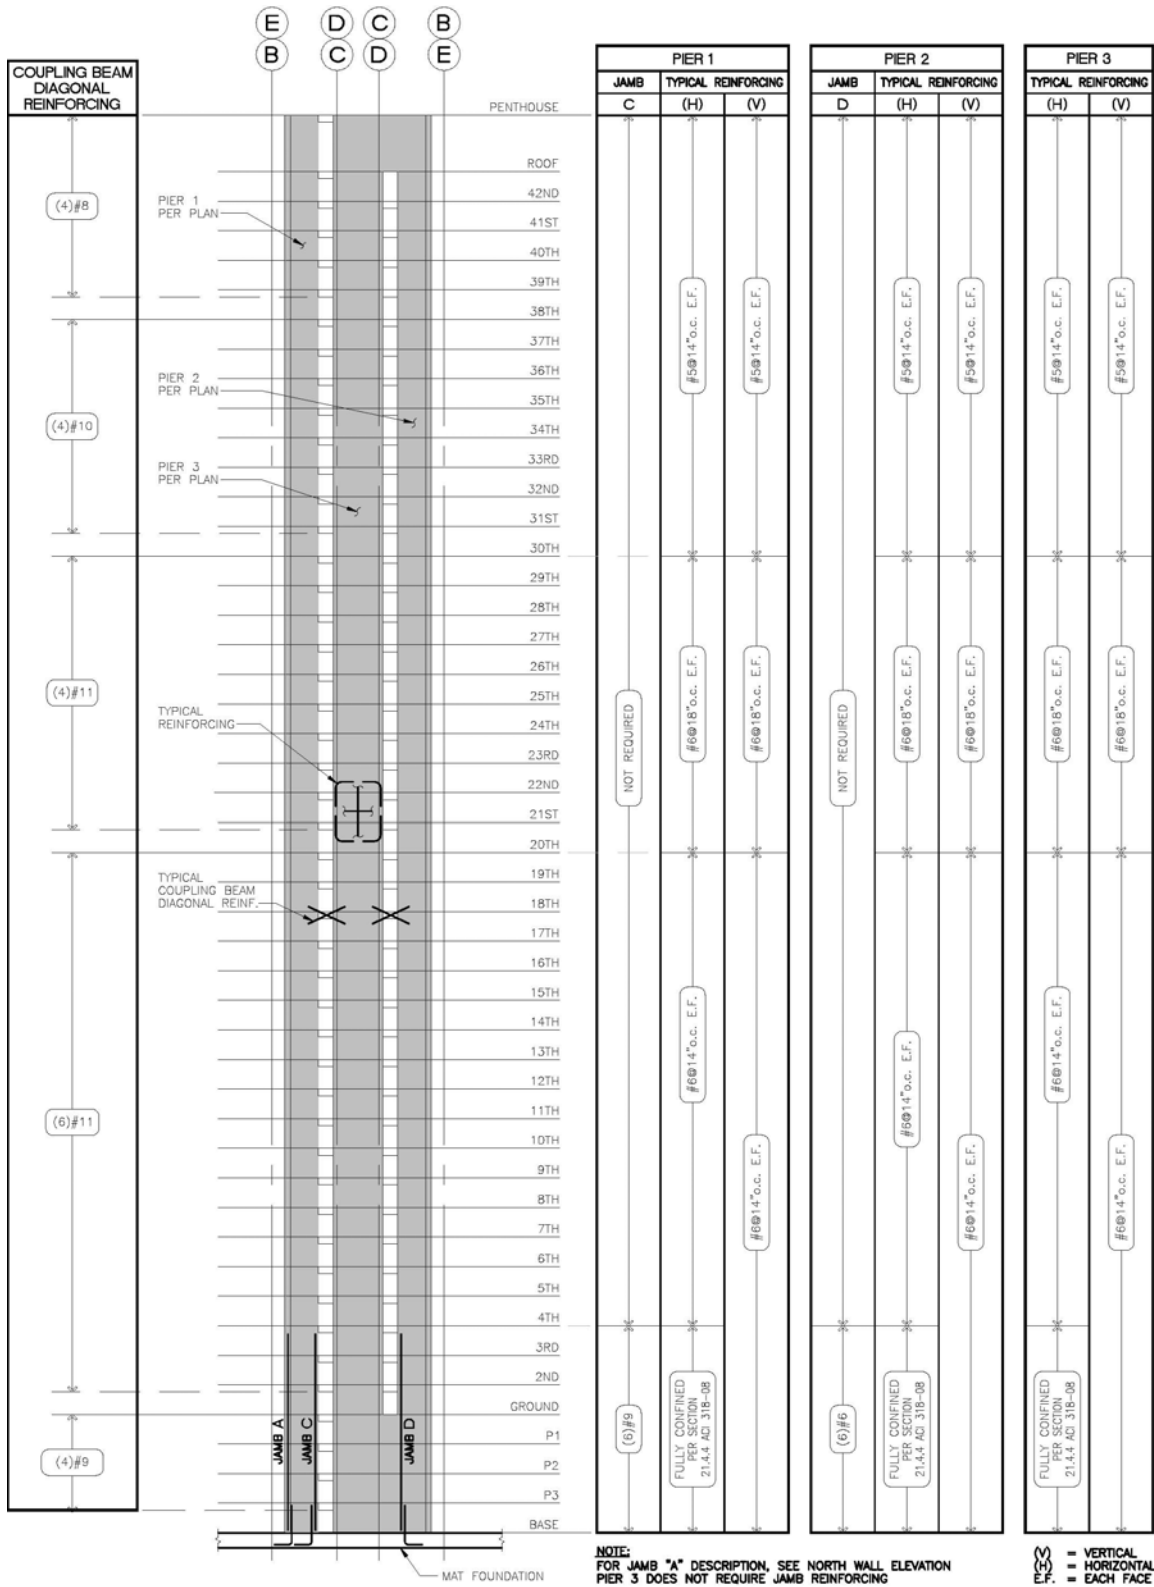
Elevation A and shear wall reinforcing for building 2B
